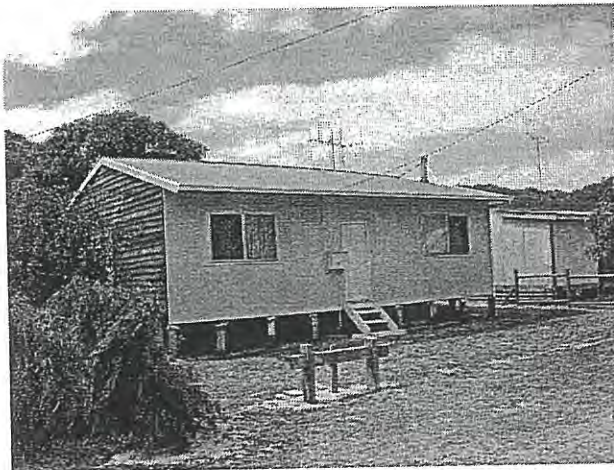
The timber boarding to the front of this cottage has been replaced with flat cement sheet
